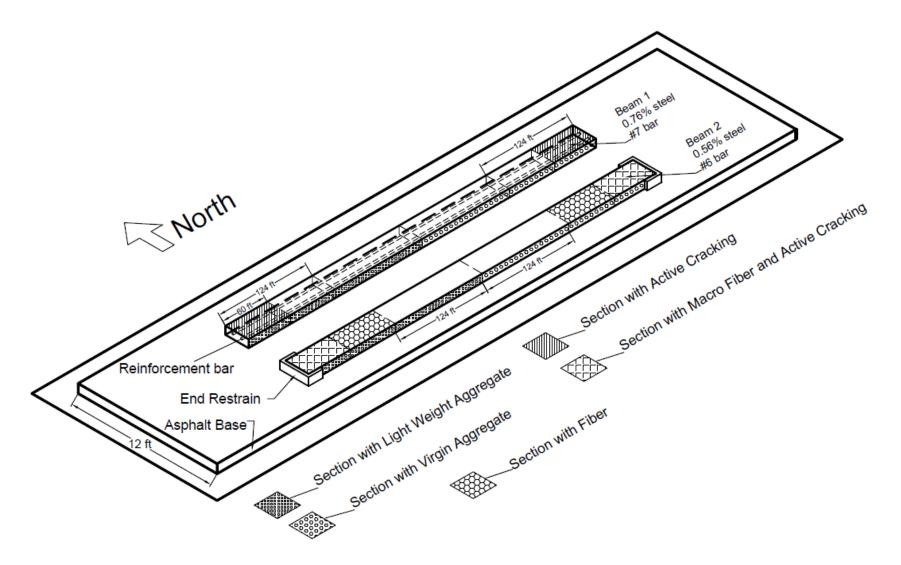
Isometric view of two continuously reinforced concrete beams with different design and material features.
